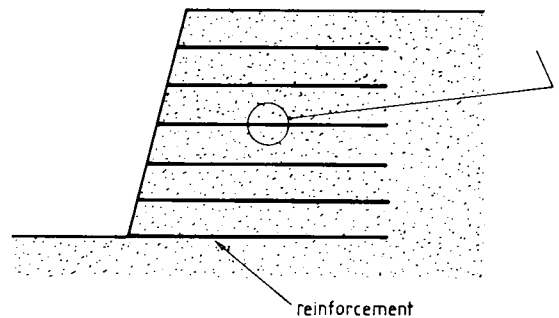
Typical Examples of Soil Reinforcement Application
